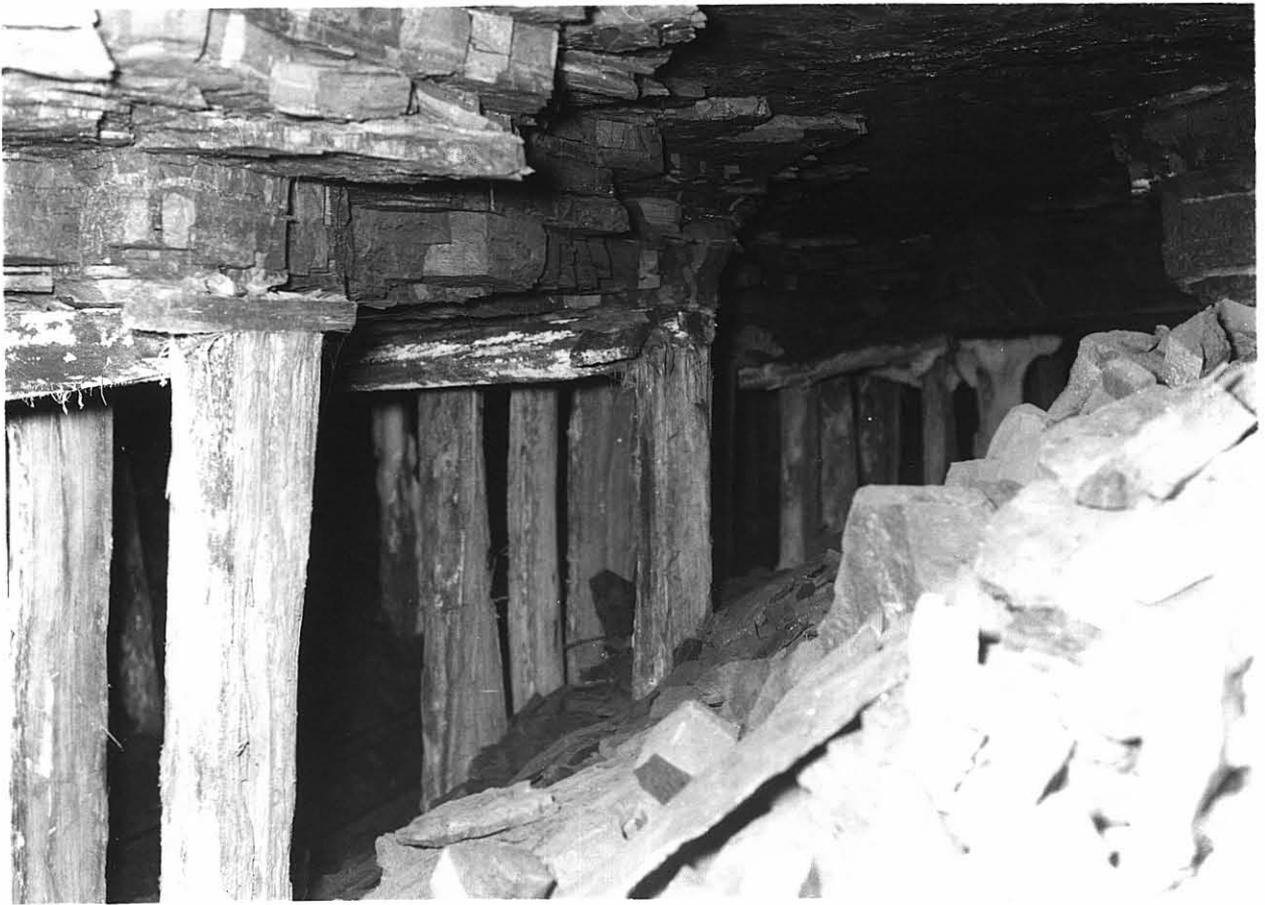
Right Hand Workings showing roof collapse in carbonaceous sandstone between the walls and supports.
